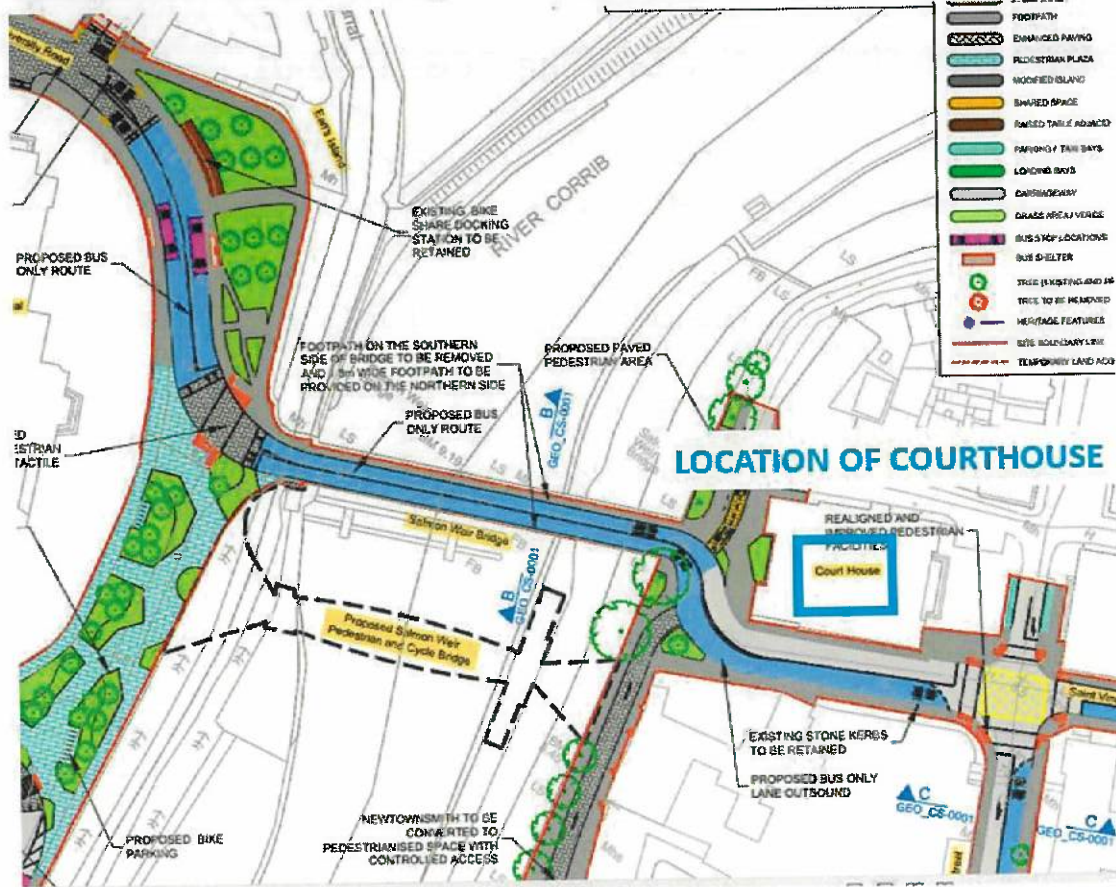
Extract from General Arrangement Drawing BCG-GA-00-02
